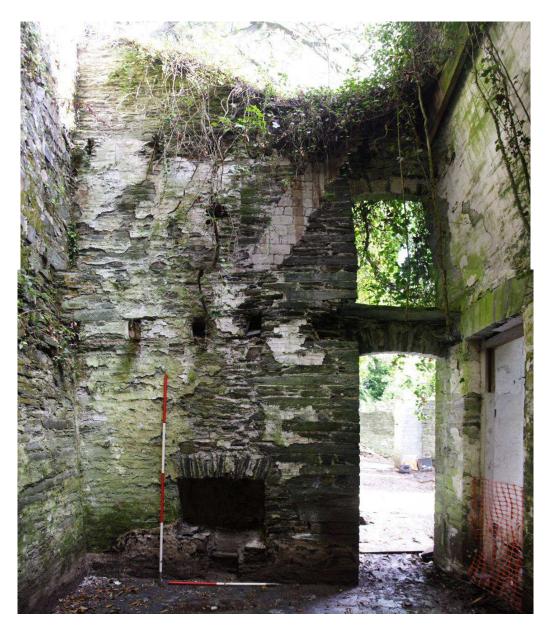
Southwest facing internal elevation of Room 3, showing the adapted end wall of Room 2, and that of Room 5 to the right, 2m and 1m scale
